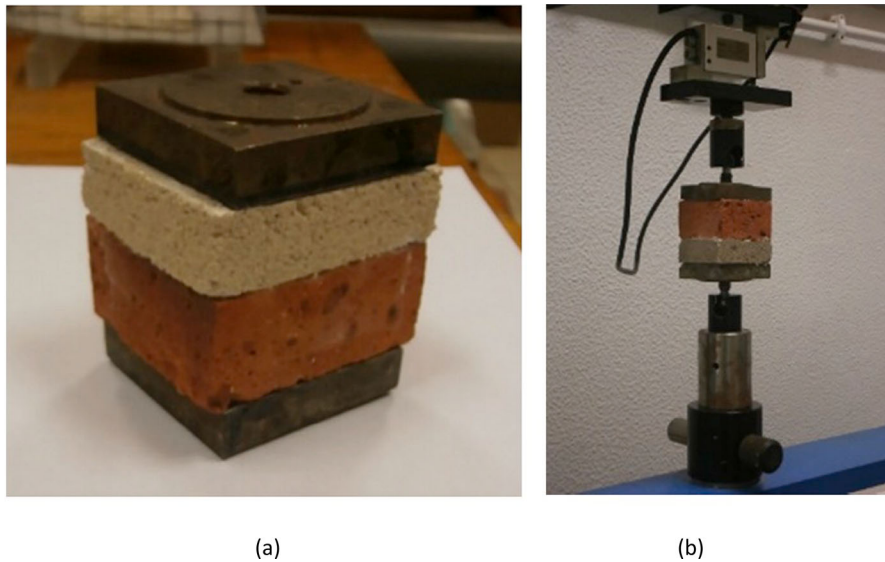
Tensile bond strength test for lime-based mortars: (a) composite specimen prepared for testing with about 20 mm thickness and 60 mm × 60 mm surface dimensions; (b) test set-up
